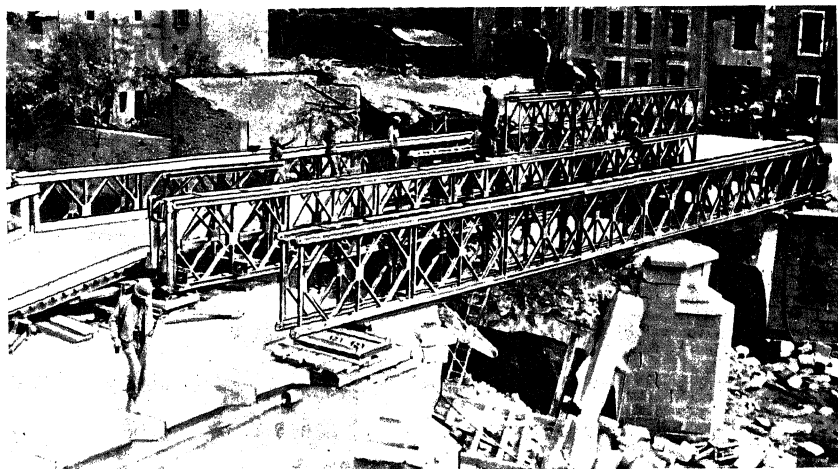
Converting single-lane bridge to two-lane bridge using single-girder method for launching outer girder in second lane. Note single lane open to traffic during construction.
